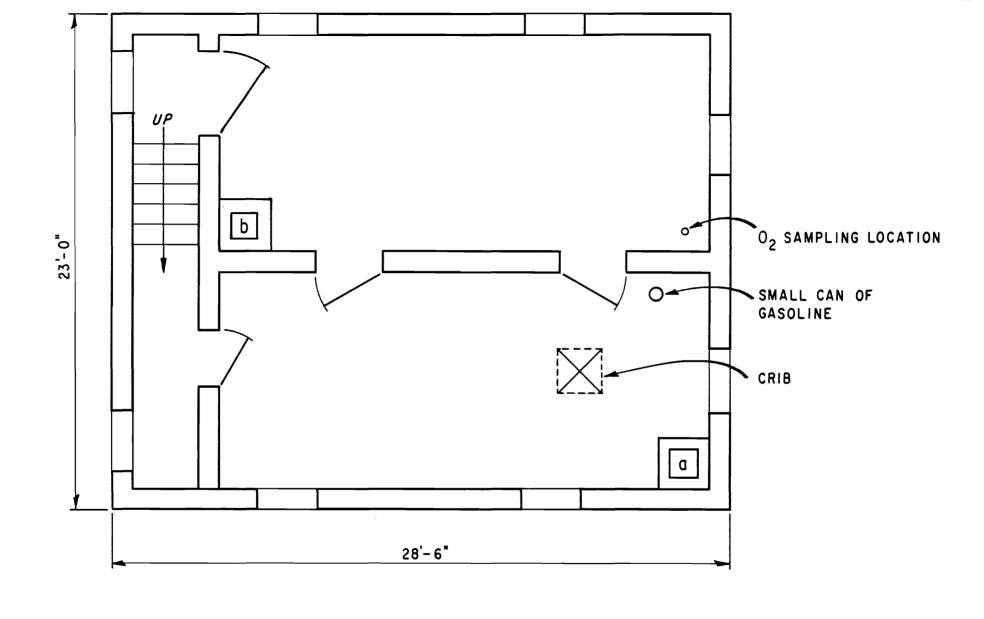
SECOND FLOOR PLAN, FIRE TEST BUILDING GRAVENHURST
